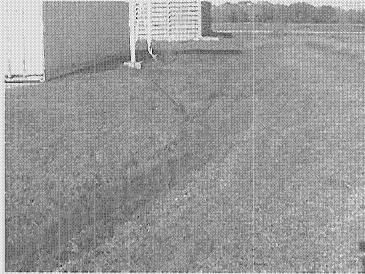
Proposed Site, NASA Consolidated Battery Test Facility, Johnson Space Center, Houston, Texas. Viewed from the Eastern Boundary of the site, facing West. Building 354 borders the site to the west. Subsurface utilities are clearly marked in the foreground.
